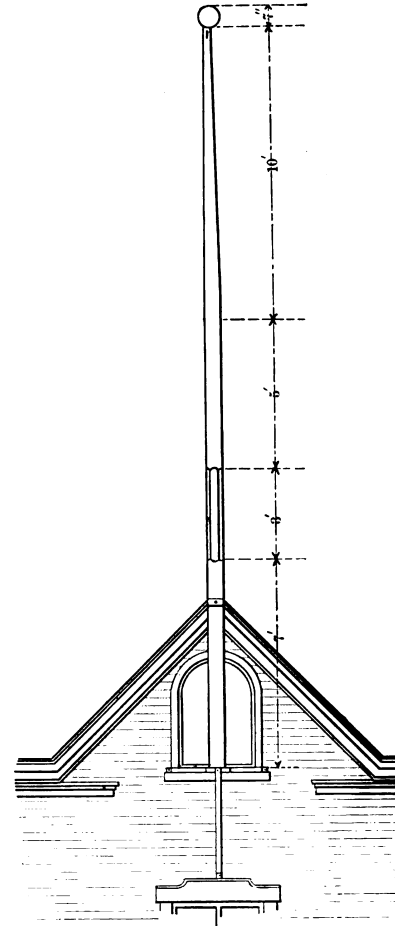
Flagstaff for the Gable of a Building.—Scale, 3-16 Inch to the Foot.
